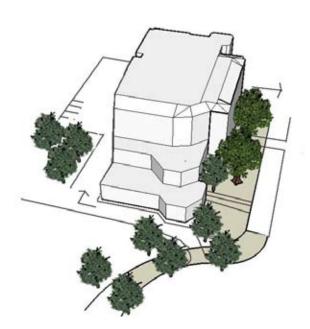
Buildings are articulated to provide aesthetic interest and maximize private spaces. Roof lines fit within the character of the surrounding neighbourhood.
